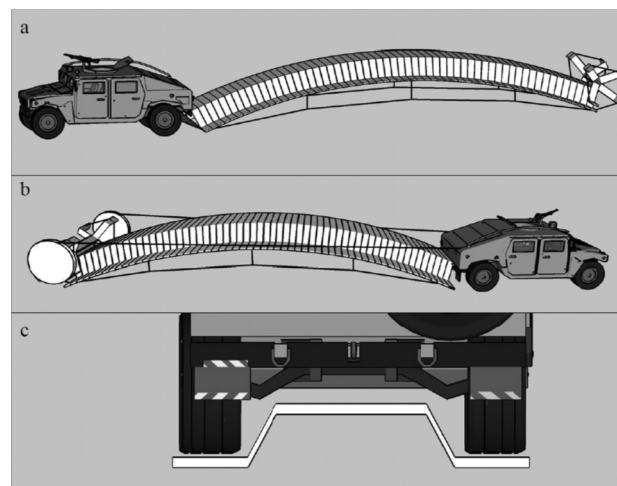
Cross section, launching and retrieval Concepts of the 15 m deployable bridge (Lederman et al., 2014)
